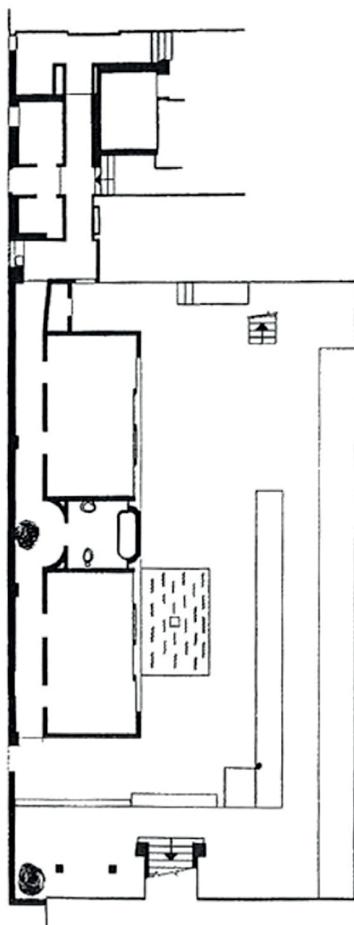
Hallway of the Wayland Young Pavilion with the "as found" tree, Bayswater Road 100, London, William J. Toomey, 1959. General plan of the pavilion.
